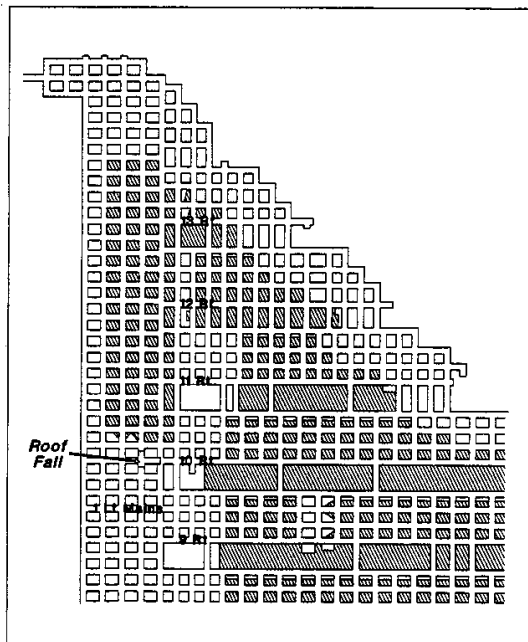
Mine A: Partial Mine Map of Pillaring Section - Roof Fall Area.
